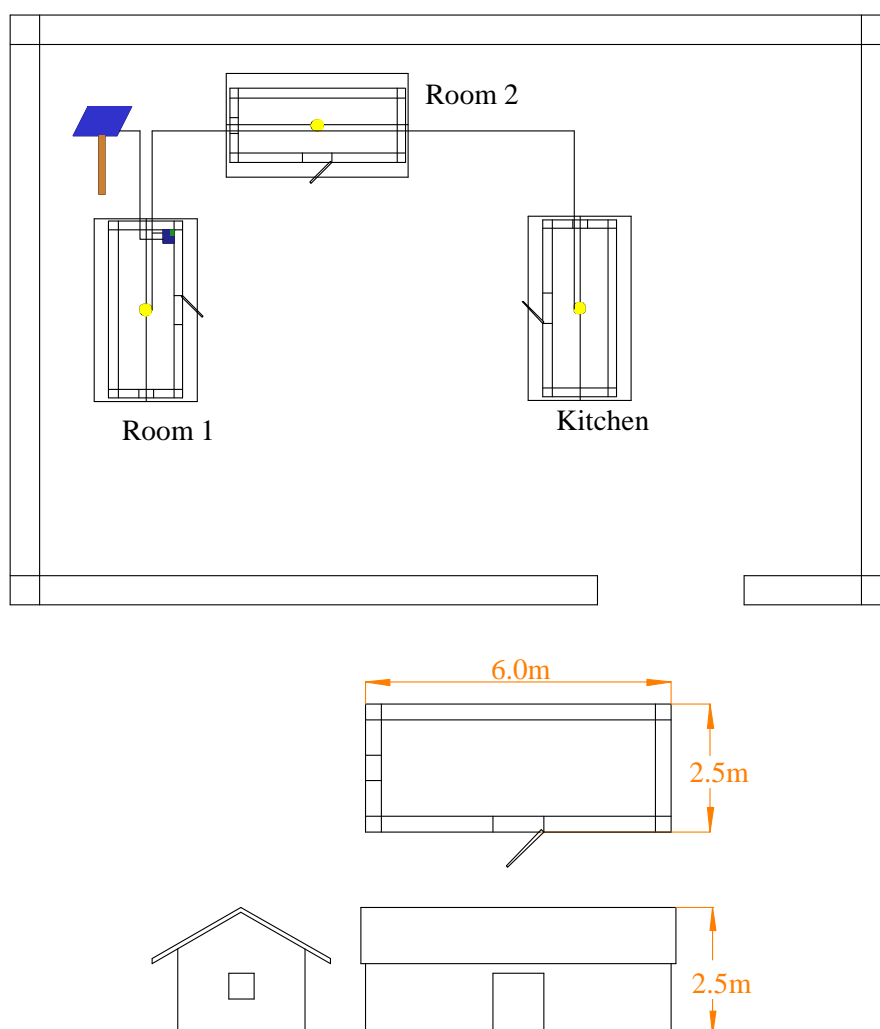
Example of Household and Wiring (Sun Juan)
